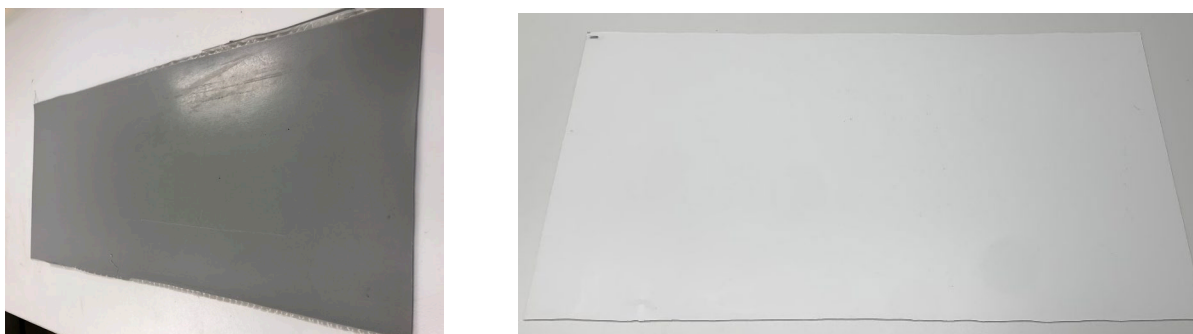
Underside of Nitoproof 910 – Waterproofing Membrane
